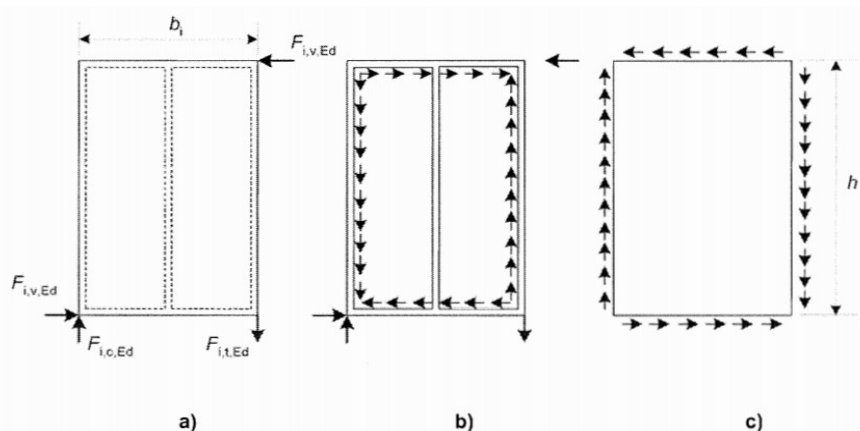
Forces acting on: a) wall panel b) framing c) sheet [33]
